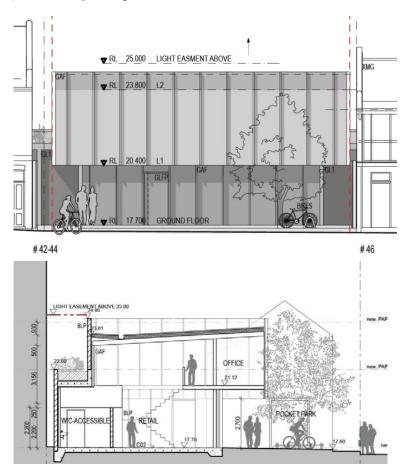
Proposed infill building elevation and section of 42-44 Kensington Lane
